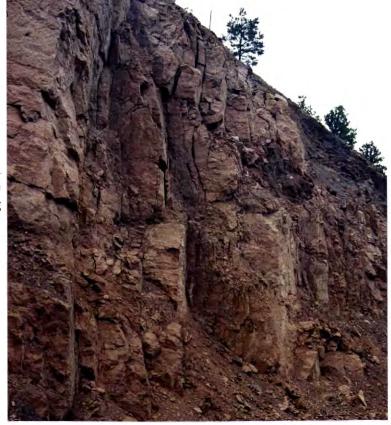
View of open joints in the massive rock section of the cut, indicating potential toppling failures.
